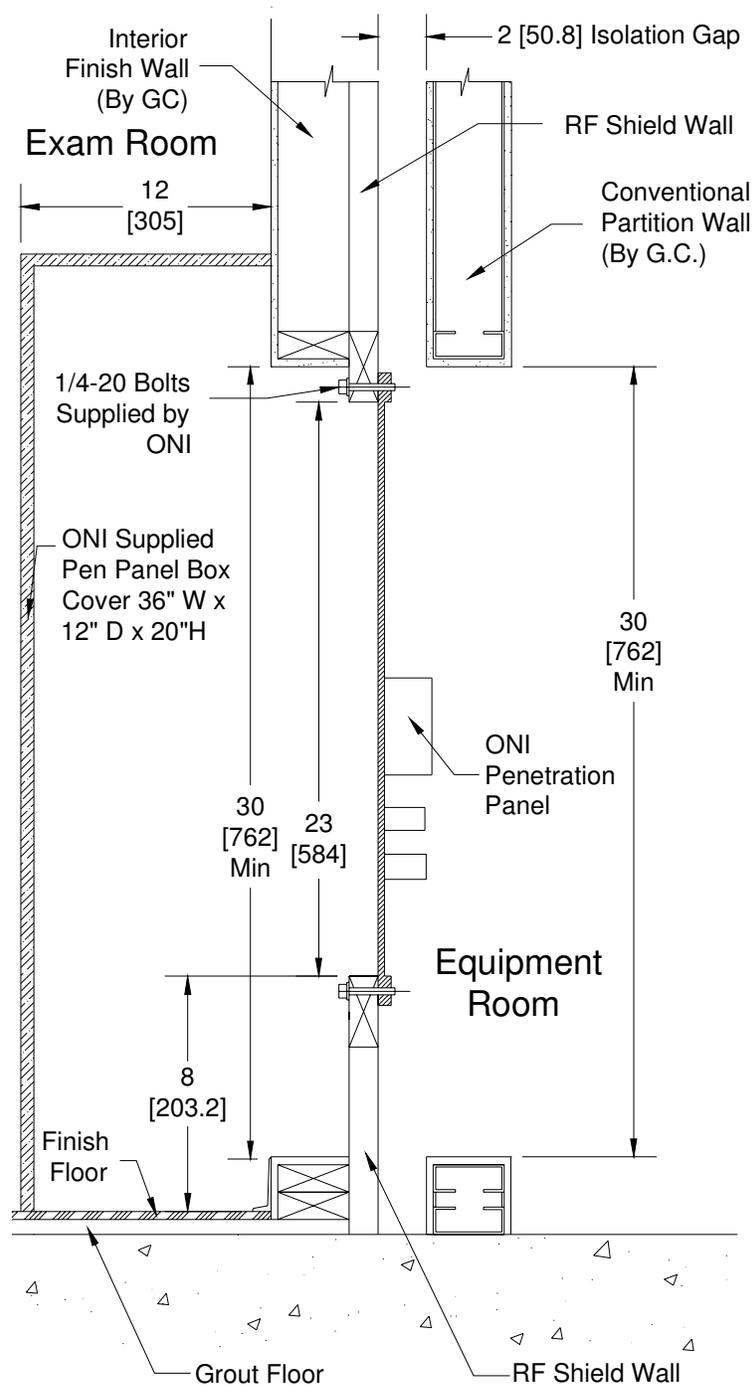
Pen Panel wall section. Typical shown. Shield wall/floor detail may vary with RF subcontractor.
